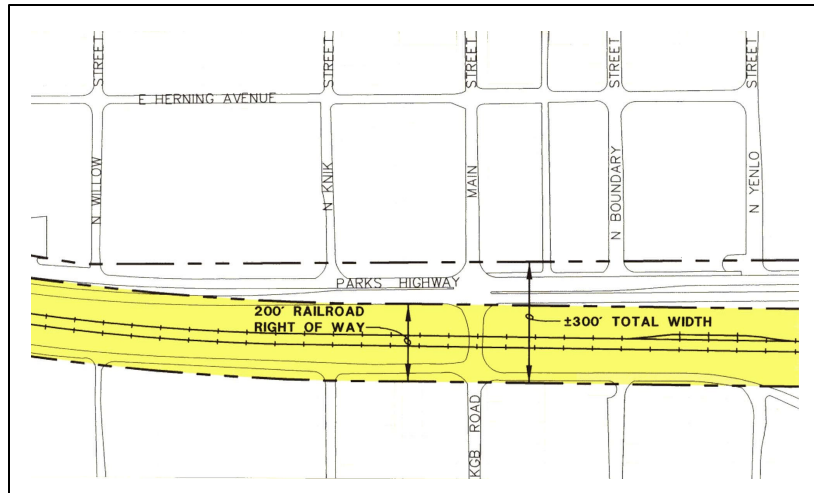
TYPICAL RIGHT OF WAY, DOWNTOWN WASILLA
